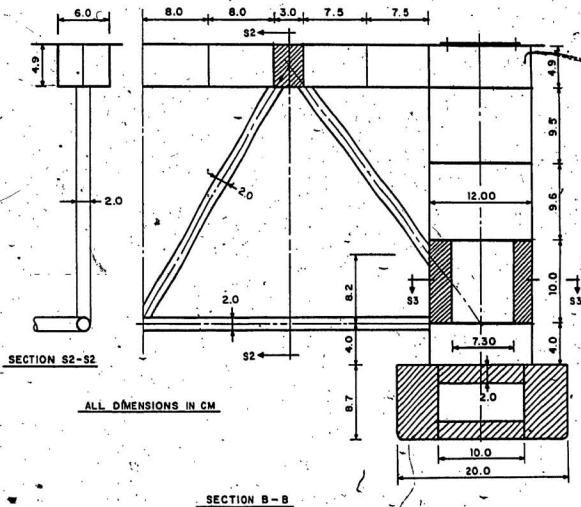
c STRUCTURAL DETAILS OF THE MODEL
